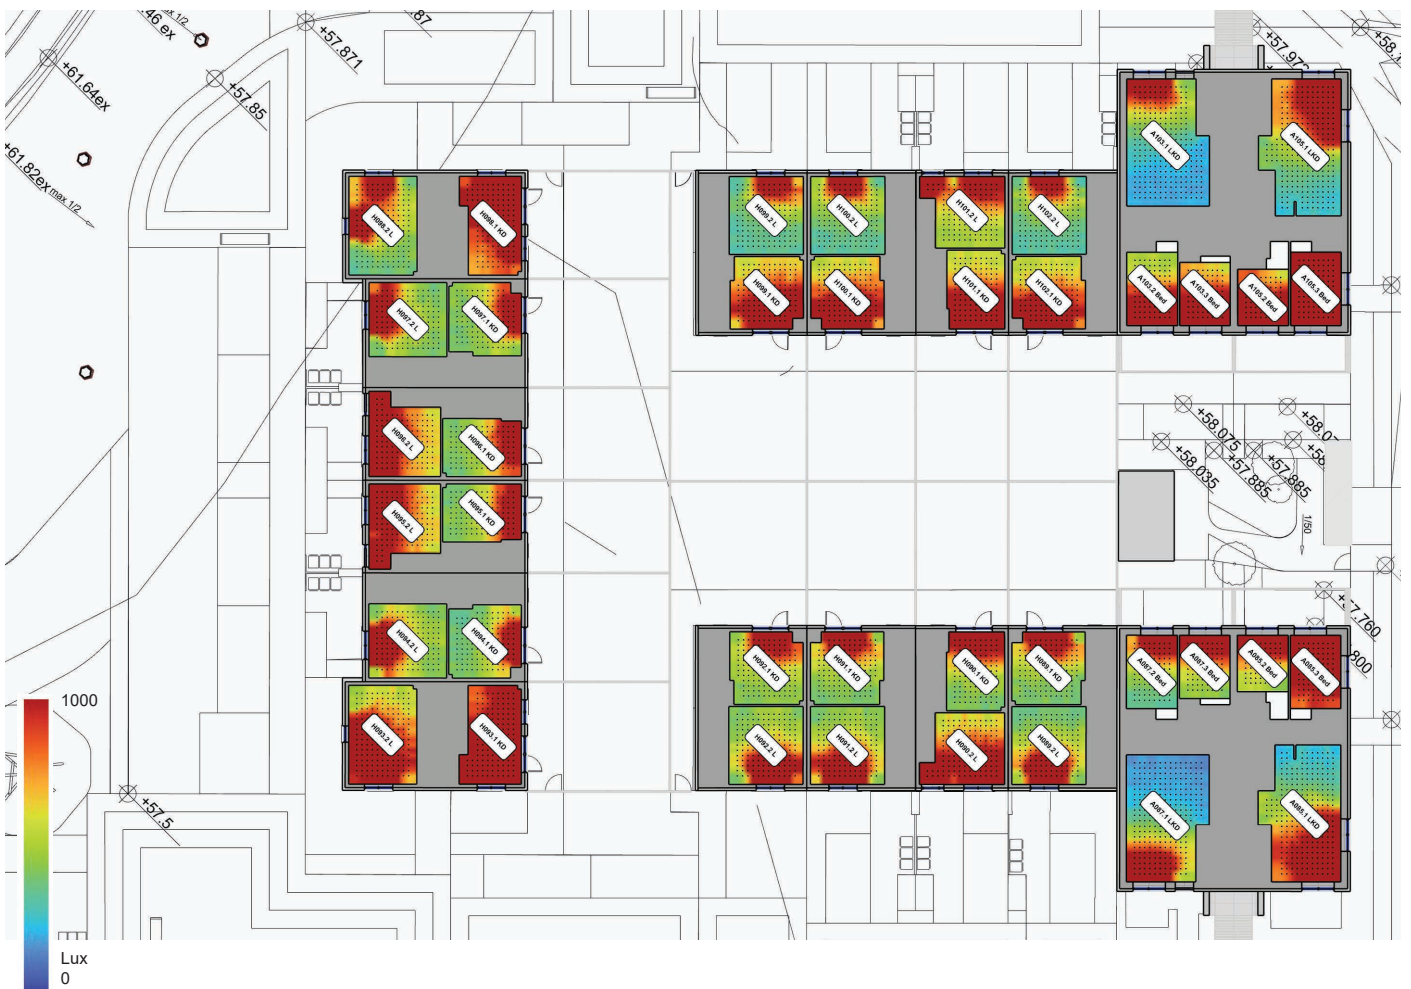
No.s 85-106 Ground floor plans indicating Daylight Provision to EN17037:2018 Table A.1
